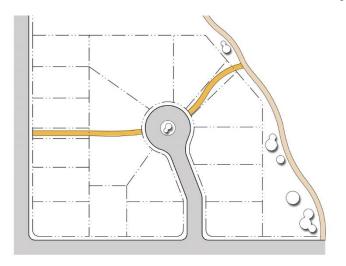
Walkways and Bicycle Routes. Where streets will not connect or where larger blocks are platted, connections for pedestrians or bikes may be required through blocks or at the ends of disconnected streets. (24-301.b.3).
